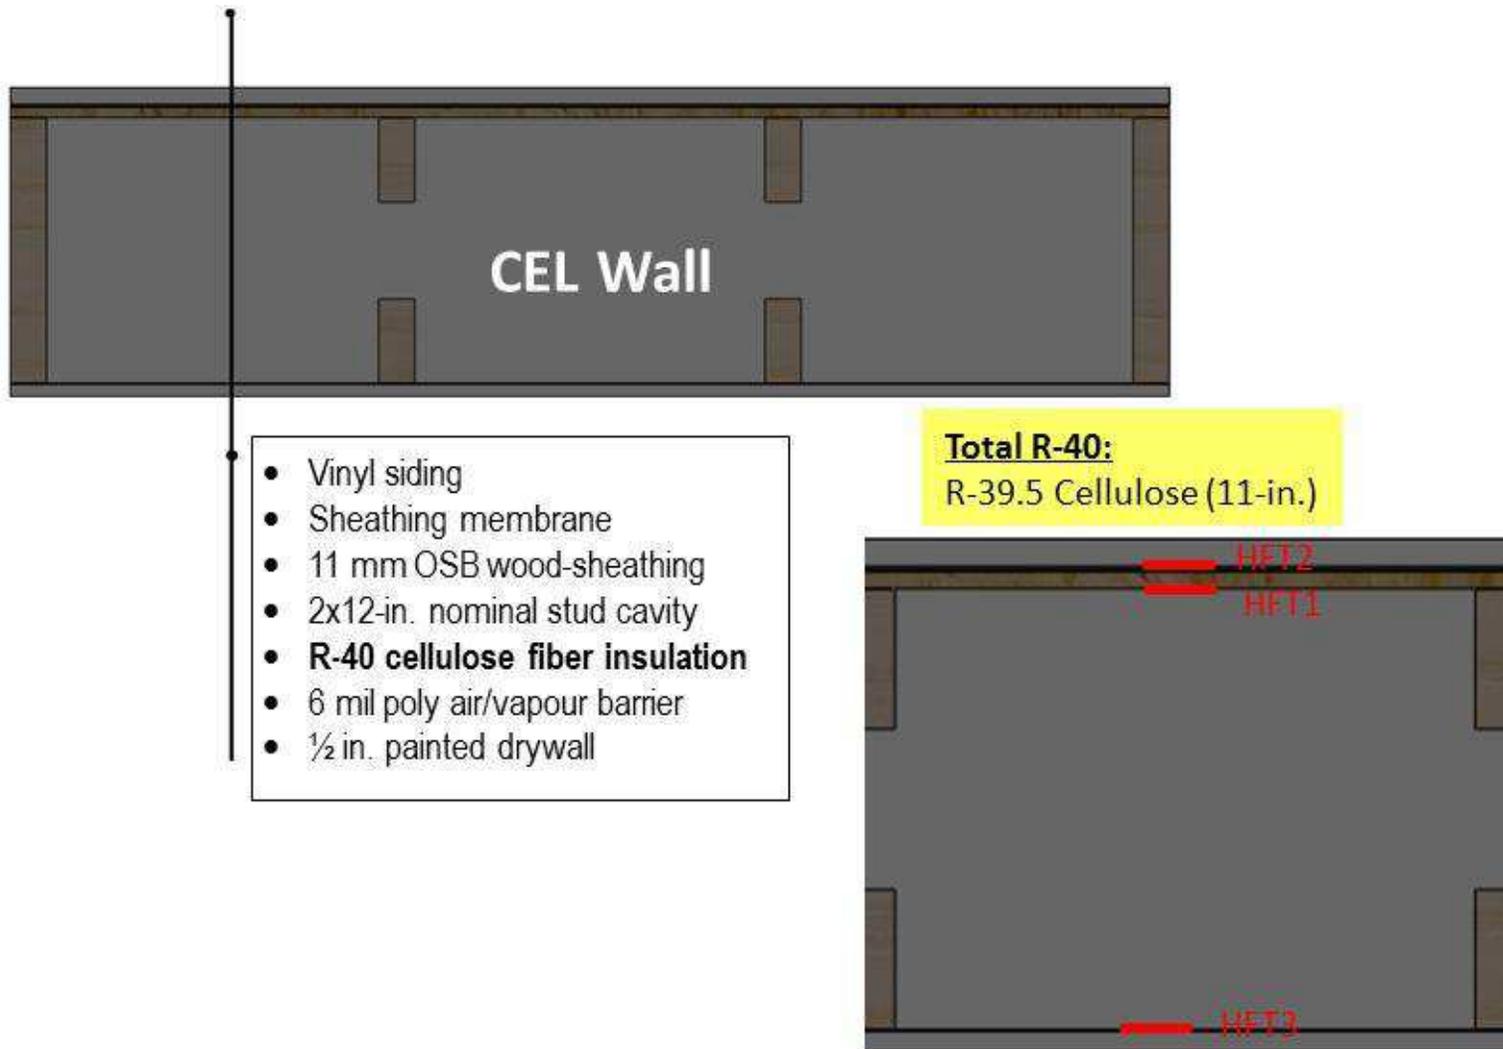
Horizontal cross-section through cellulose fibre wall assembly showing locations of Heat Flux Transducers, HFTs (Wall-6)
